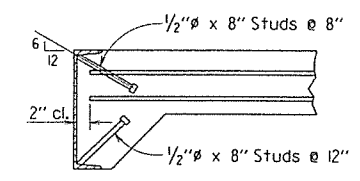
DETAILS FOR BLOCKING EXPANSION JOINT DEVICE
